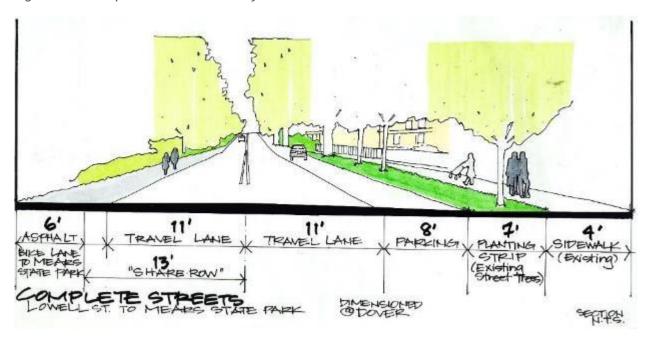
Final Digitized Complete Street Section of Lowell Street
